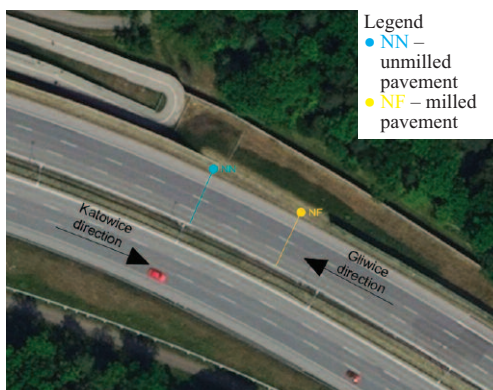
Fragment of the analysed road and the adopted measurement cross-sections
